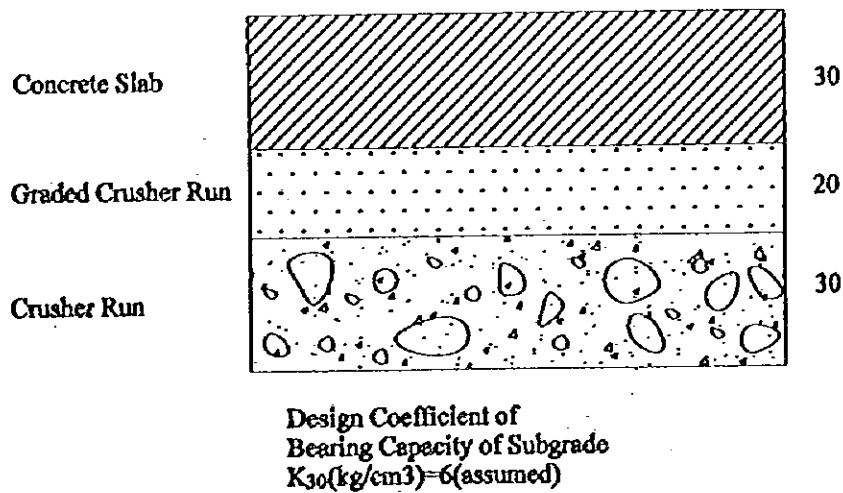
Standard Cross Section of Container Yard Pavement
